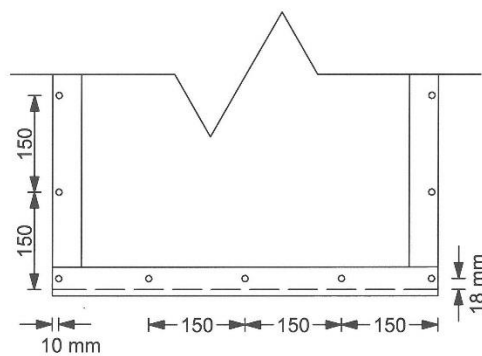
Daiken Customwood 600 mm Long Specimen Fastener Spacing Pattern (Similar pattern for the 1200 mm long specimens)
